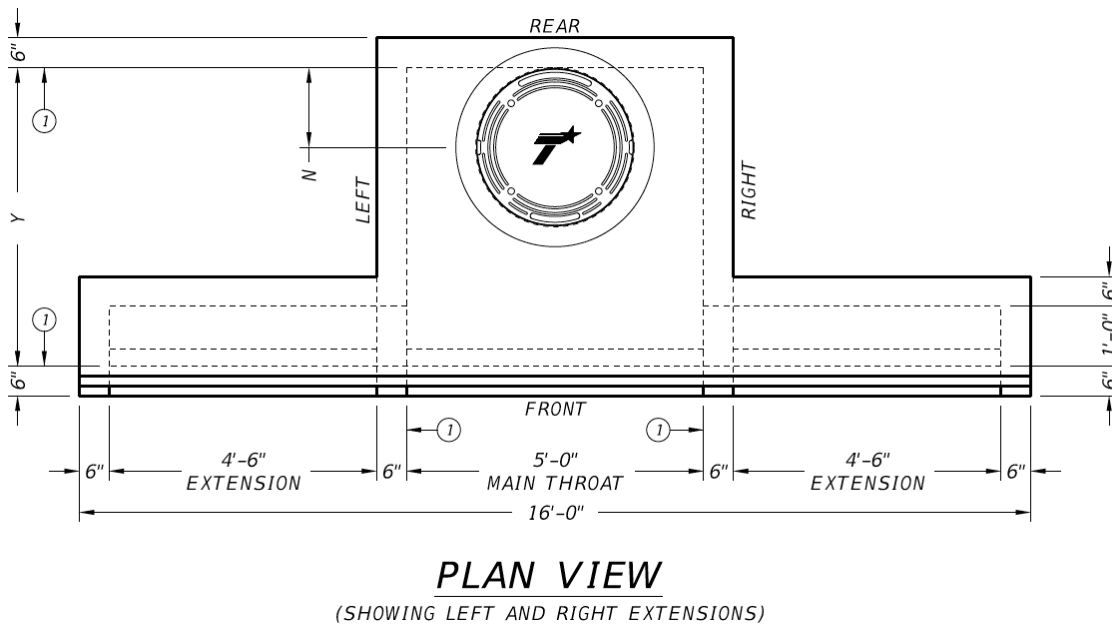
Plan view of new TxDOT Precast Curb Inlet Outside Roadway (Type PCO) extracted from file presd03.dgn (January 2015 revisions).
